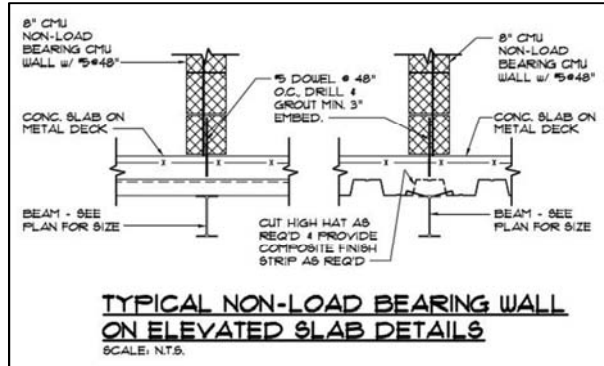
Typical Non-Load Bearing CMU Wall on Elevated Slab Detail
